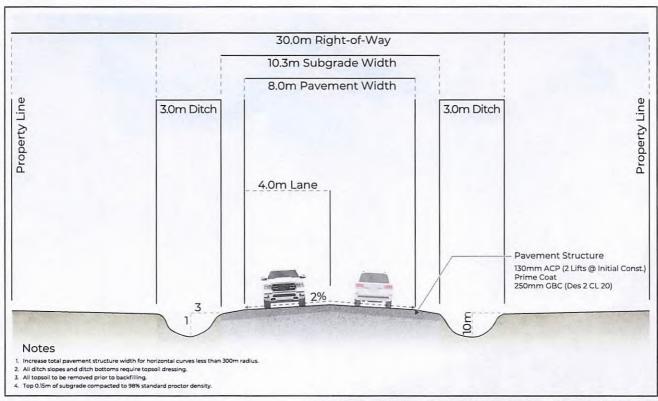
TYPICAL COMMERCIAL INTERNAL ROAD CROSS SECTION
